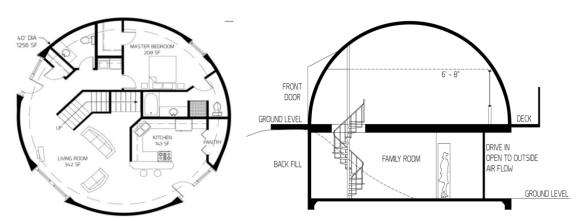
Plan showing the ground floor of an ecoshell and its section.
